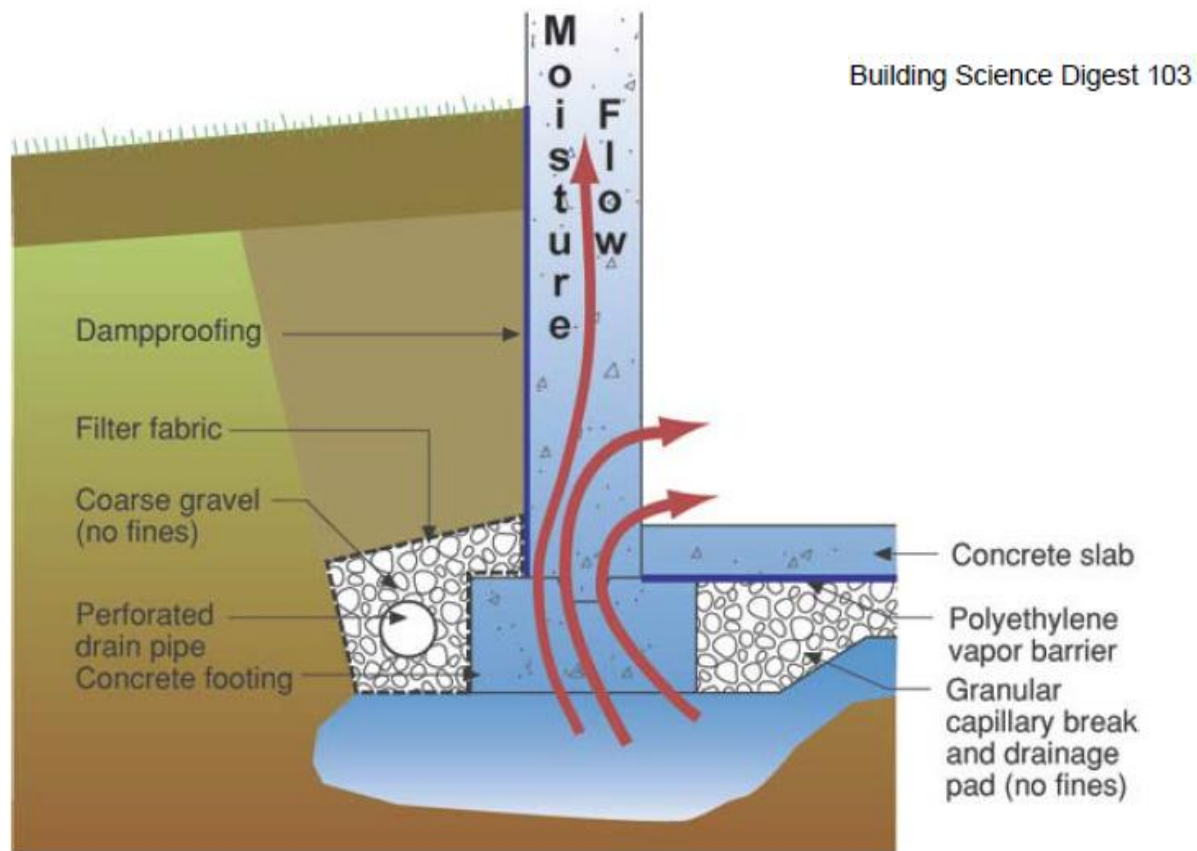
Capillary uptake of water through footing-to-foundation-wall connection
